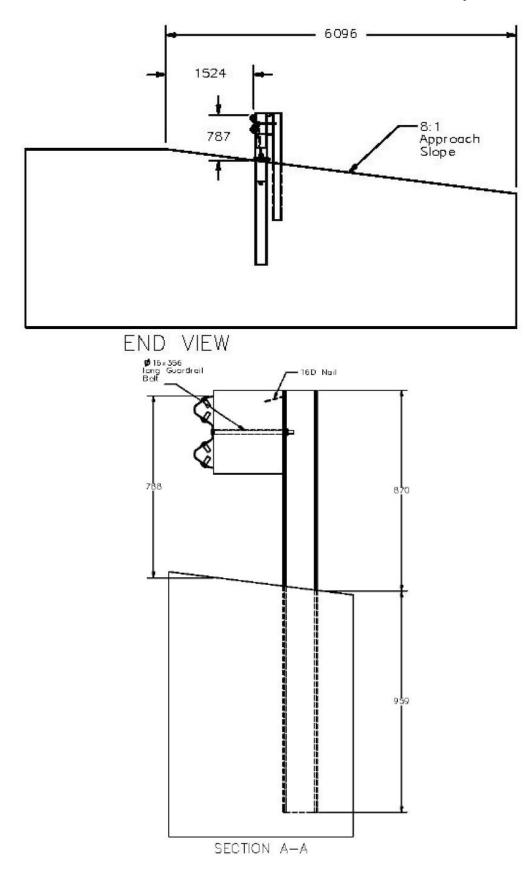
Barrier Installation, Test Nos. MGSAS-1 and MGSAS-2 [14]
